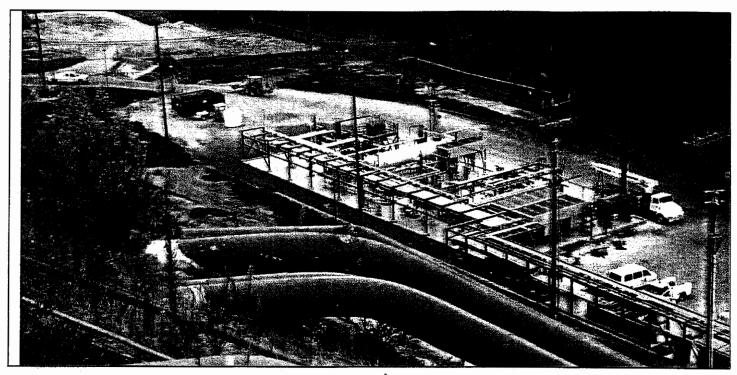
Photo taken from adjacent hillside facing west. Photo views western side of Project within fully developed facility.
